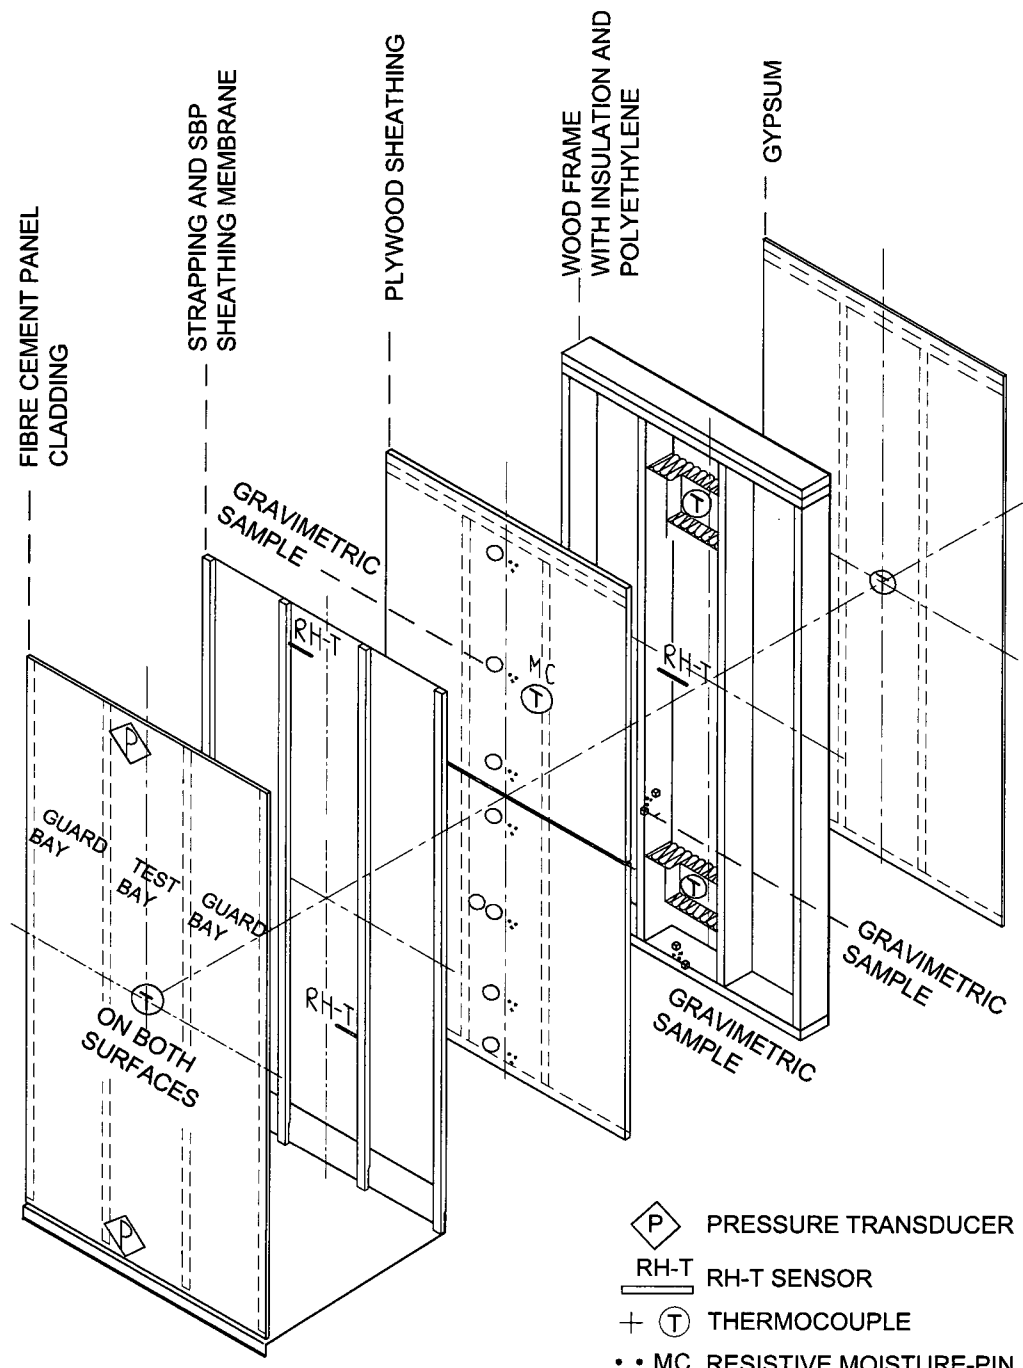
Layout of gravimetric samples and electronic sensors in a typical fibre cement wall specimen.
